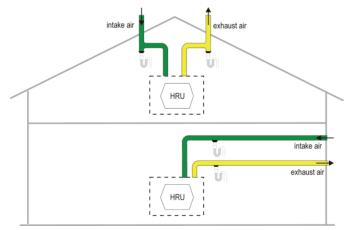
Arrangement drainage of the intake air duct and exhaust air duct
